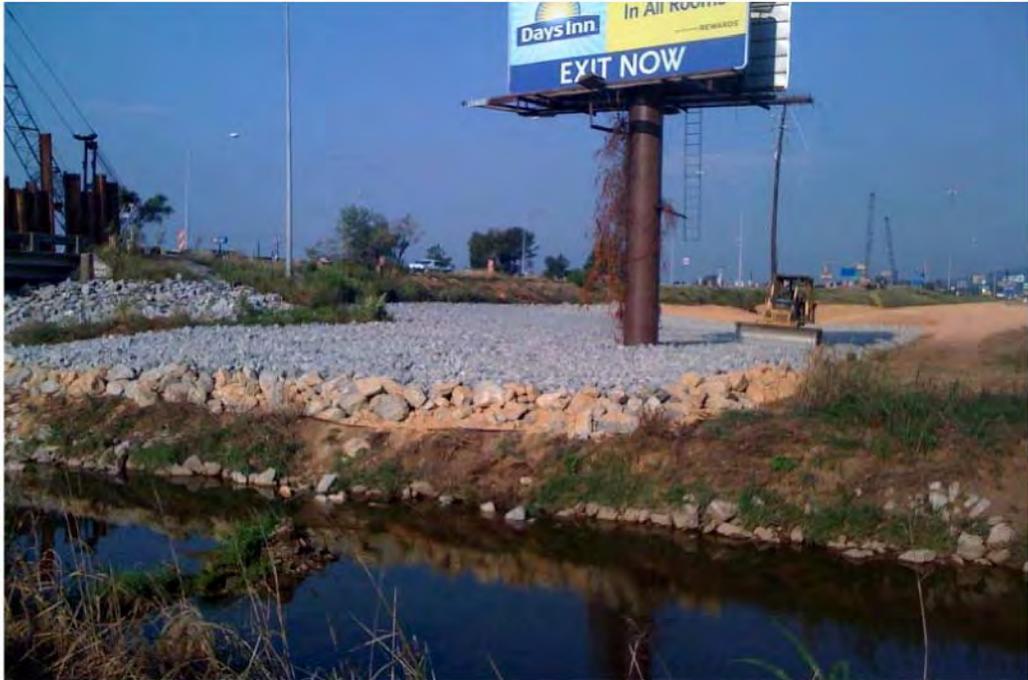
Billboard advertising sign and utility pole upgrade. Photo looks southwest.
